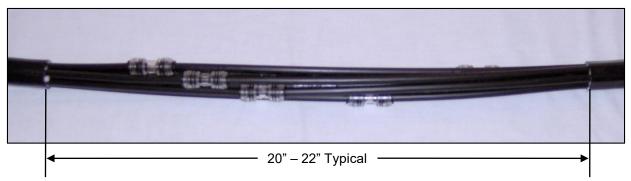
Preferred In-Line Splice for 7-Tube Cable Example
